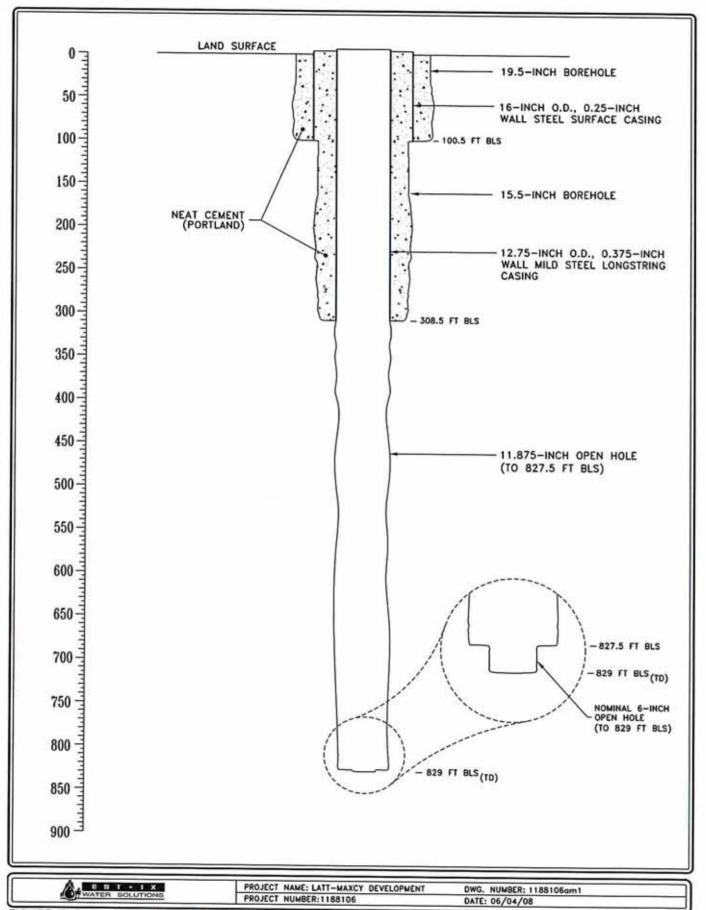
P-2 WELL CONSTRUCTION DETAILS.
